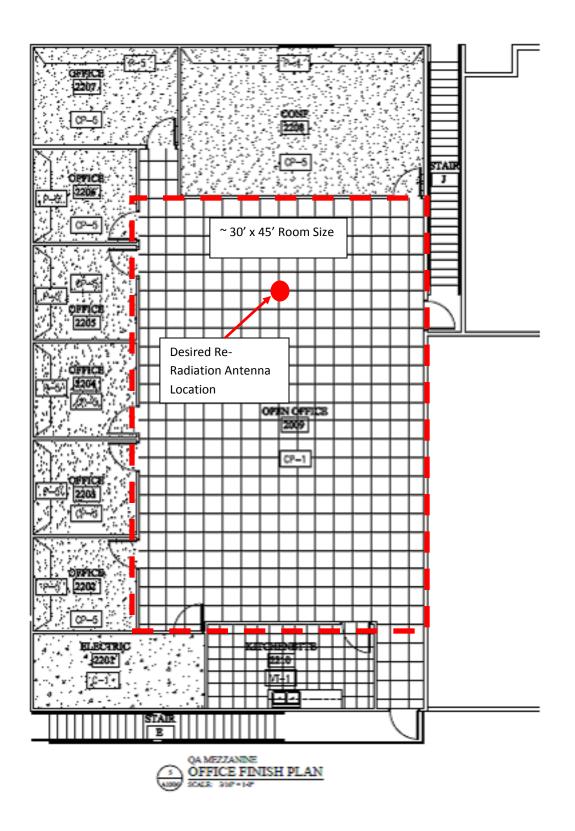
2<sup>nd</sup> Floor Mezzanine, Desired Test Area Details
